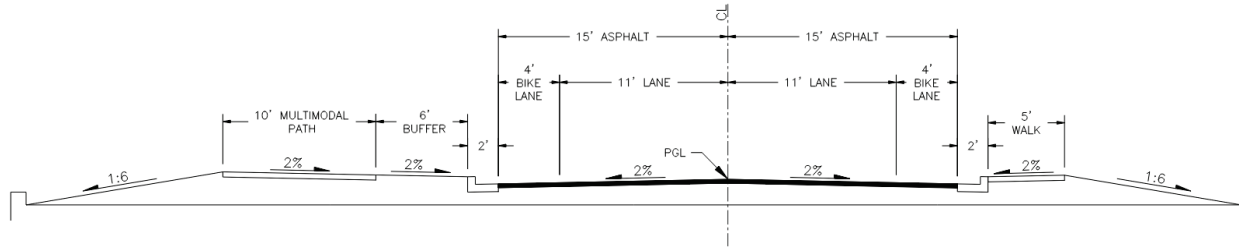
Proposed typical section of Orchard Ave in the vicinity of Bridge MM-E.5-31.01
